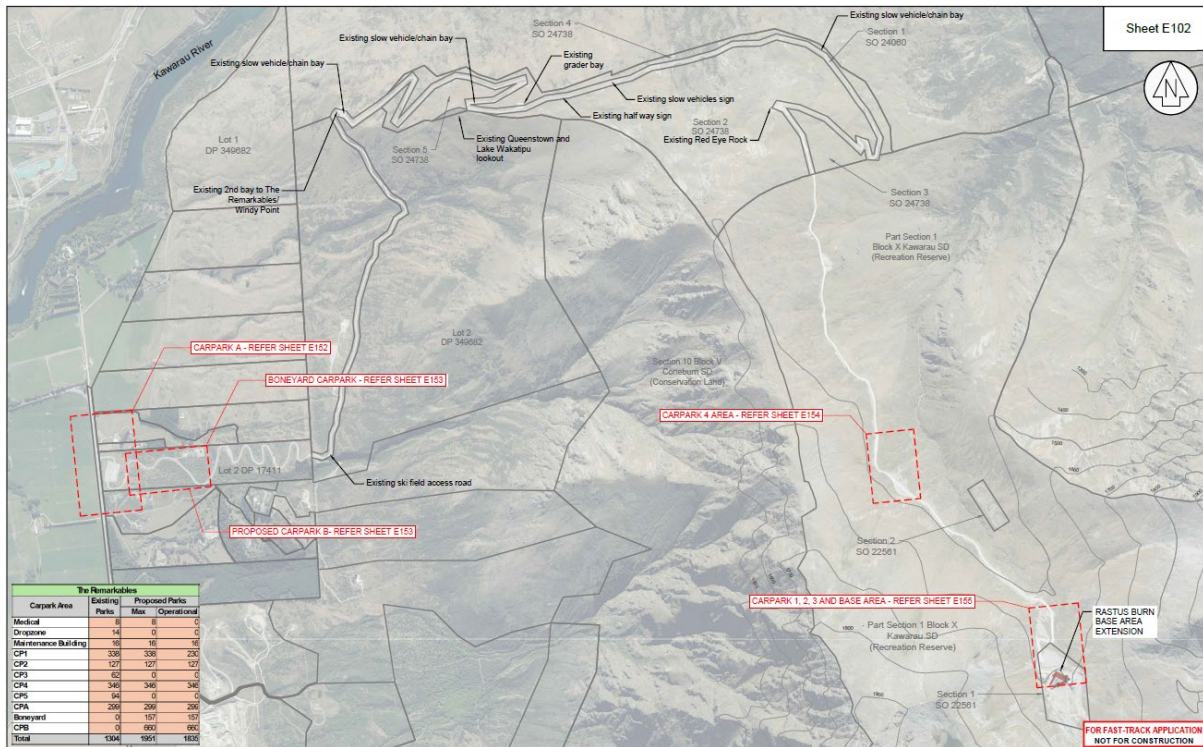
Remarkables Ski Area Car Parks (Source: Southern Land Drawing Sheet E102)
